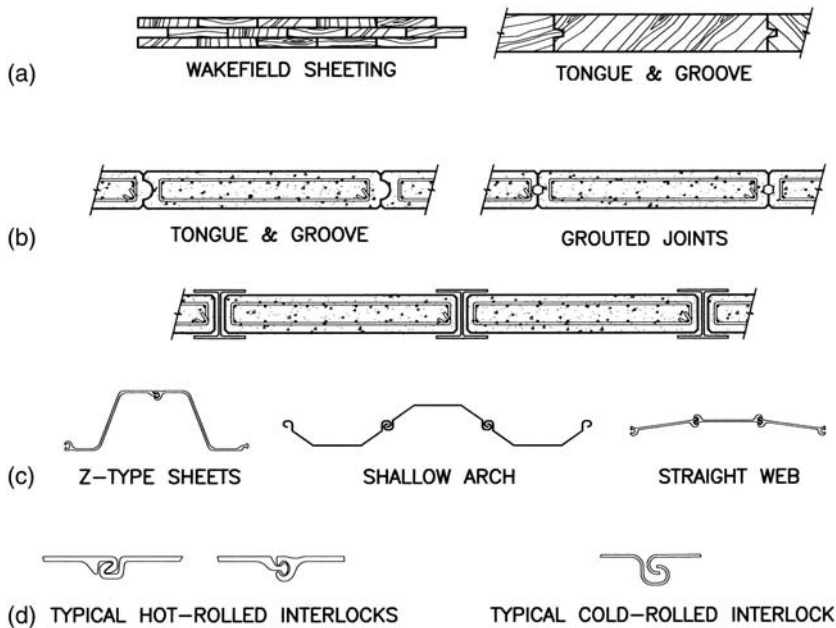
Typical sheet pile sections: (a) timber sheeting, (b) concrete sheeting, and (c) steel sheeting
